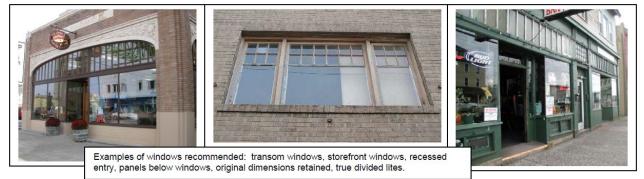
Window Detailing – Trim and casement location and dimensions
